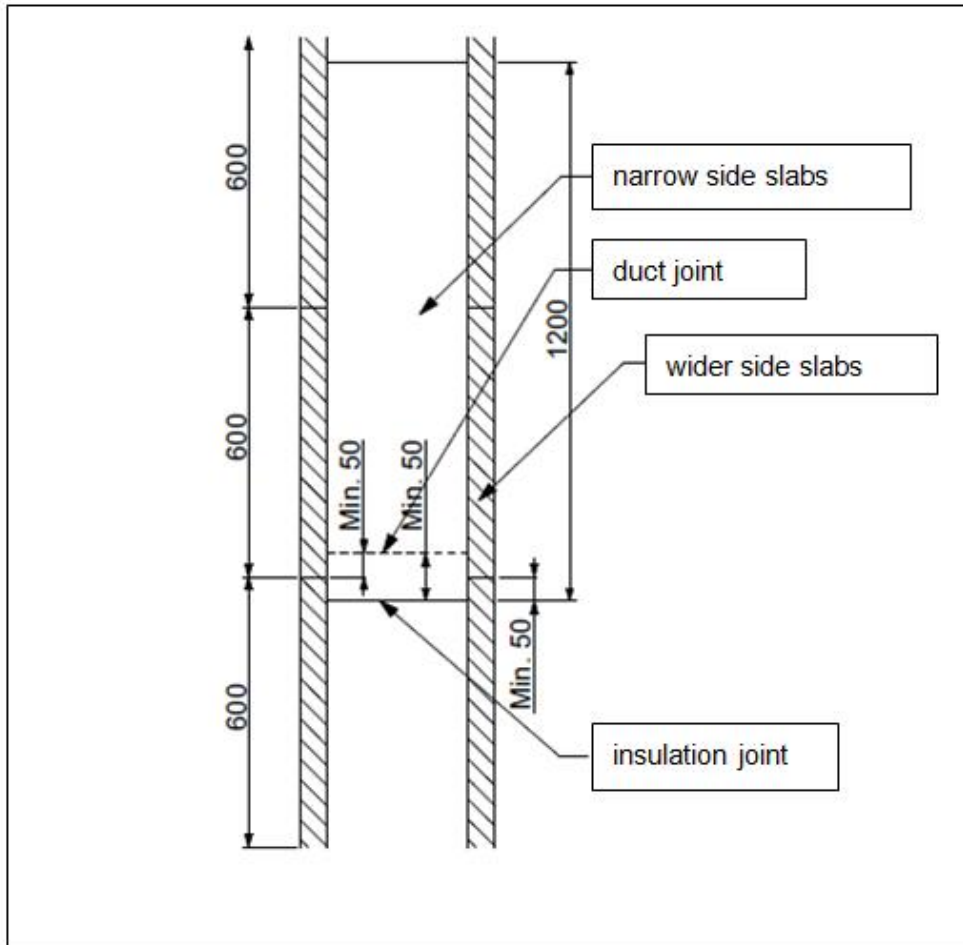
Ensuring duct joint with isolation slab, narrow side, technical drawing of principle
